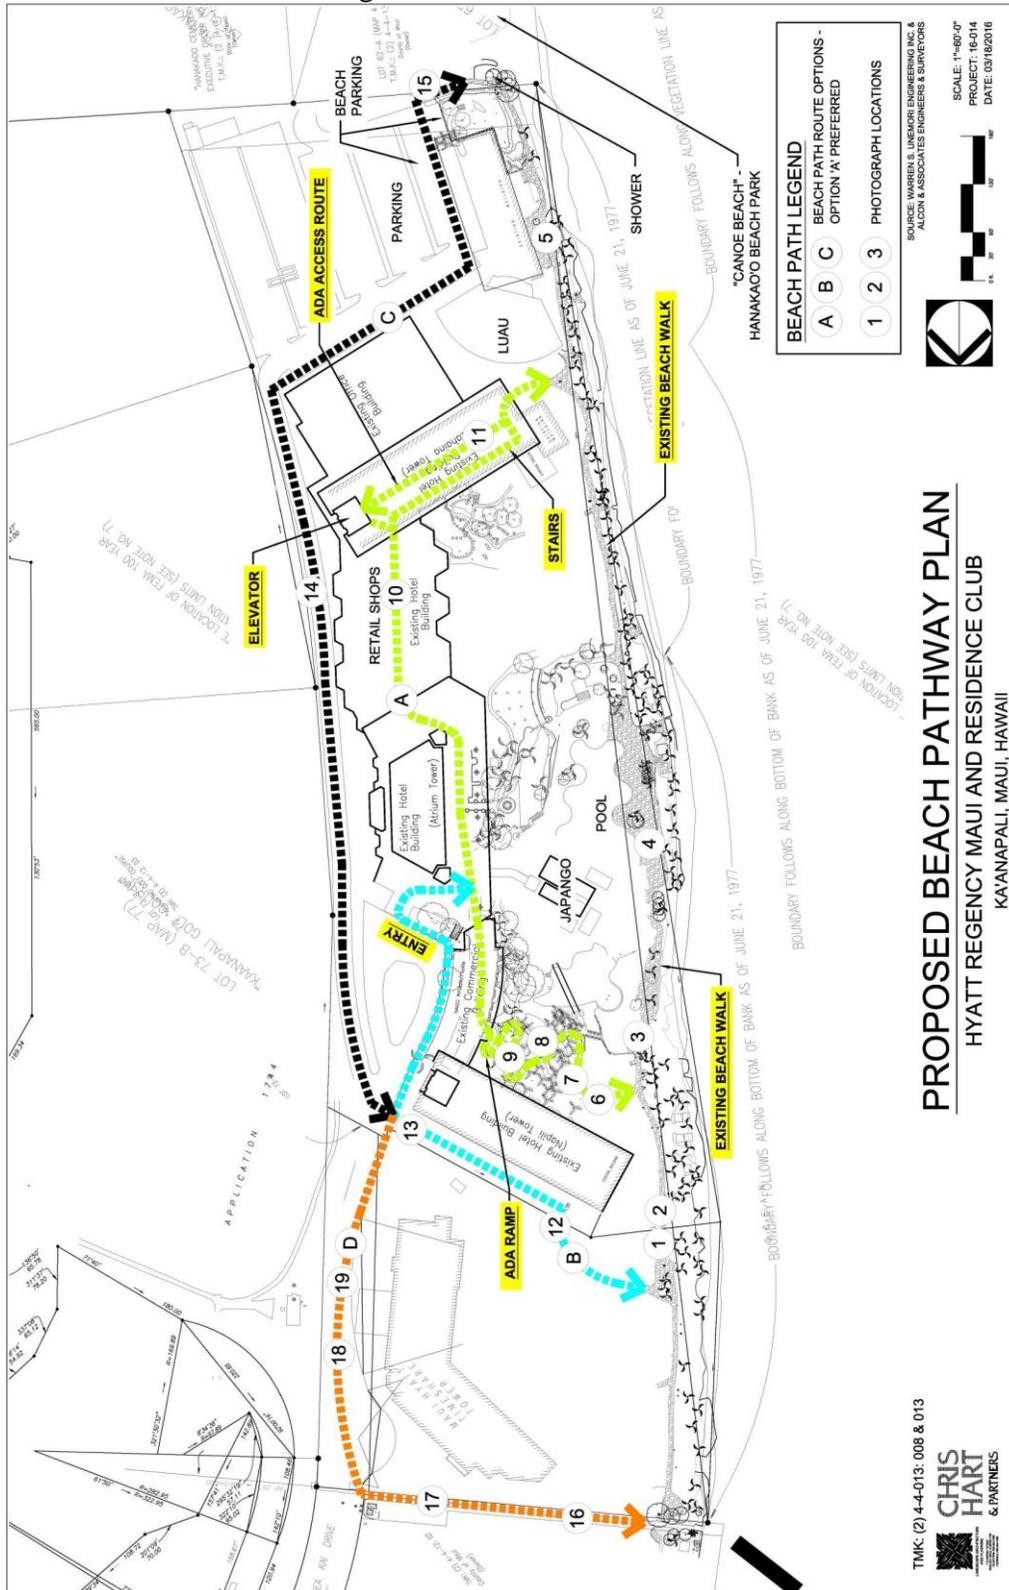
Proposed beach pathway plan – Hyatt Regency Maui
